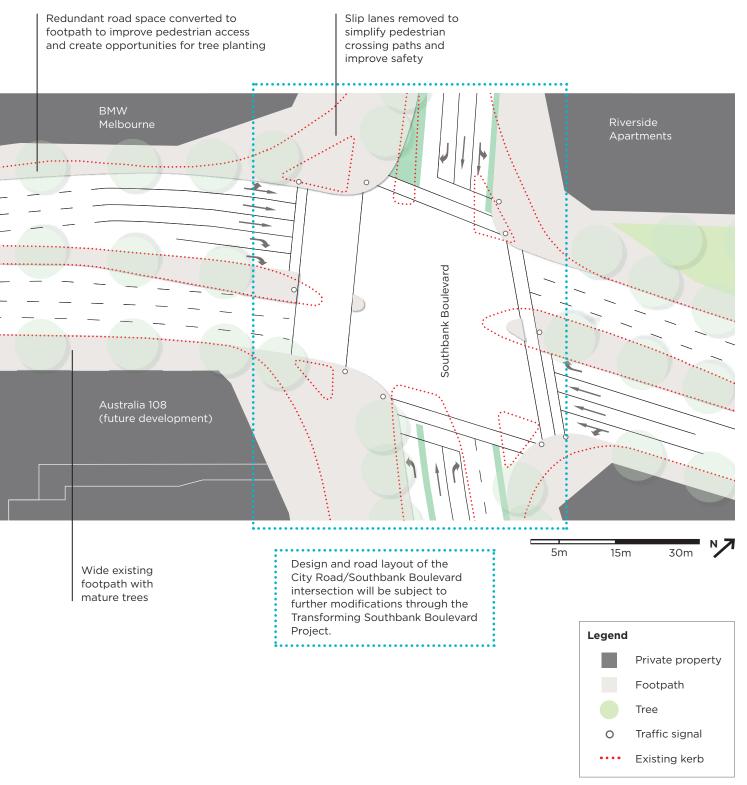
Proposed upgrade to City Road (between Power Street and Southbank Boulevard)
